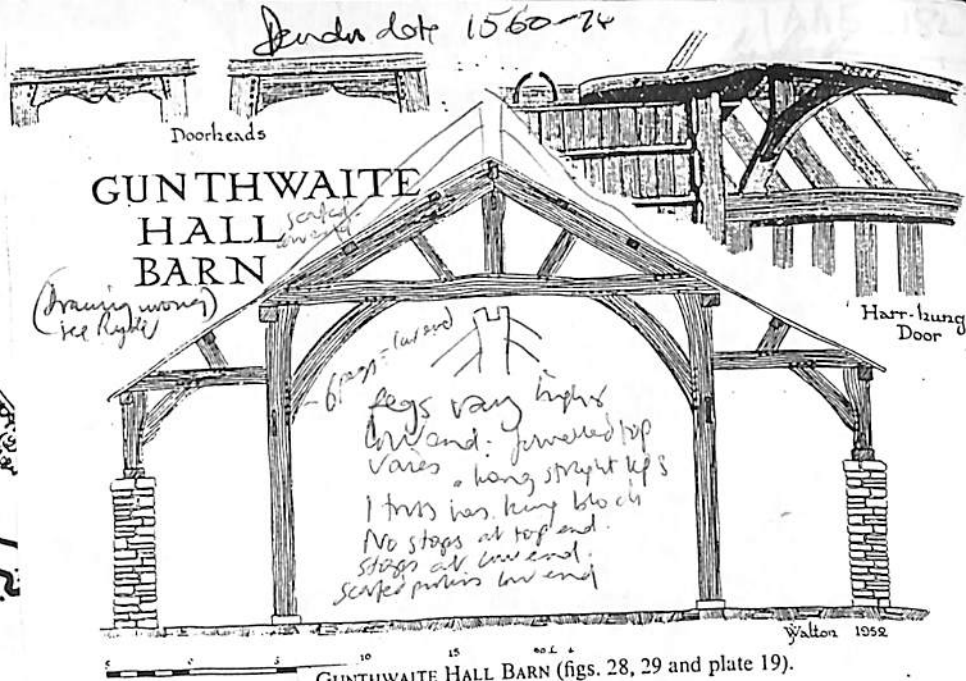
Plan and elevations of Gunthwaite Hall Barn
